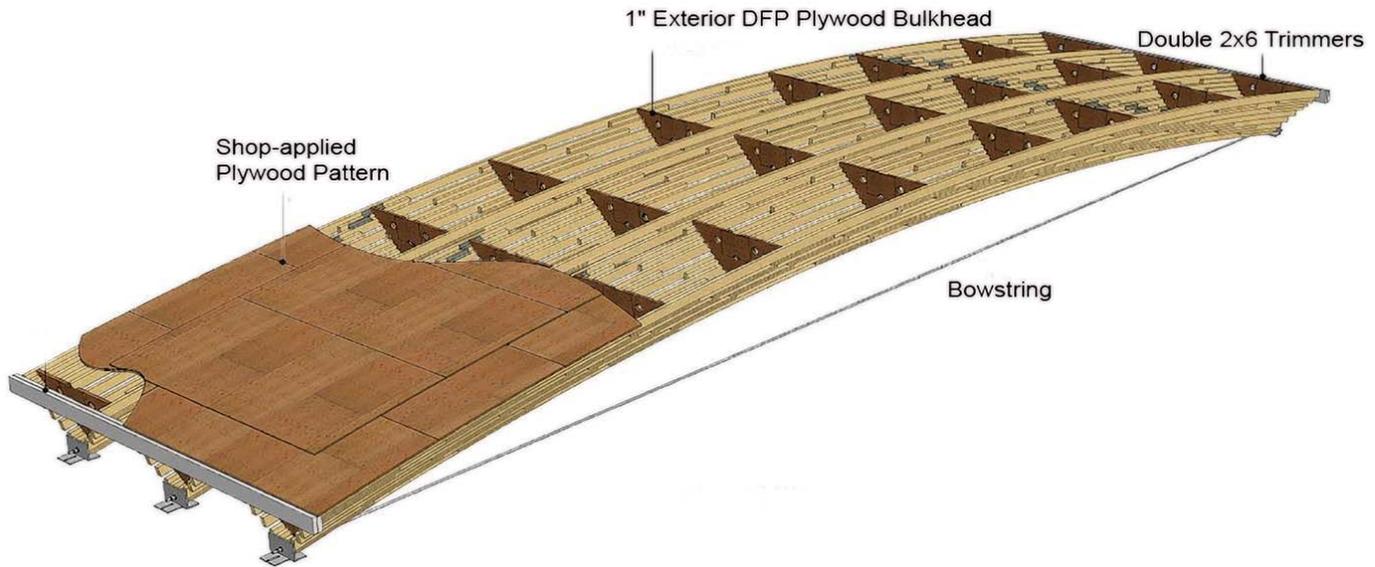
Rendered WoodWave© panel with bulkheads, stressed skin, and bowstring (Courtesy StructureCraft Builders).
